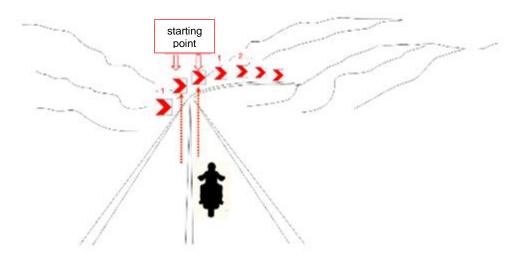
Concept of setting up traffic signs 3312 for guiding traffic on bends (Source: DRI, d.o.o.)
